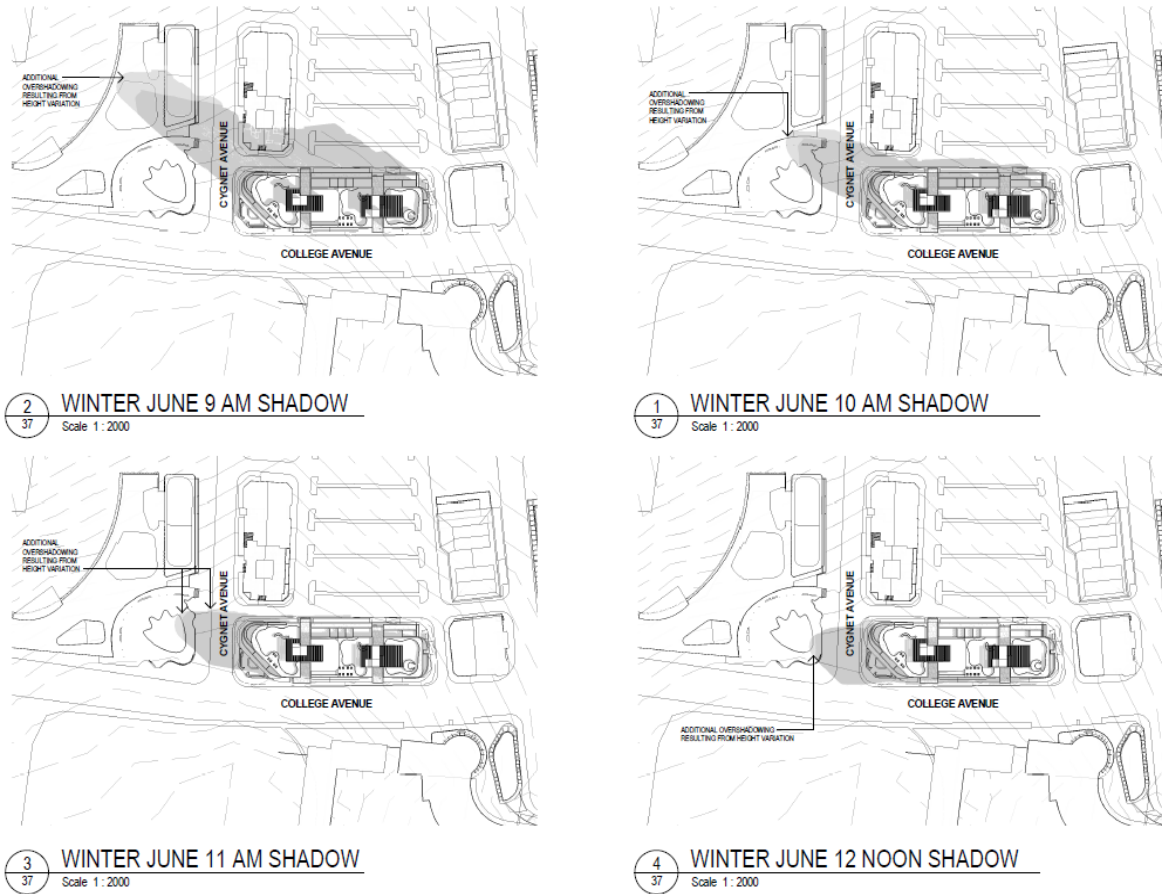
Extract from Shadow Plans (Source: DWA Architects)
